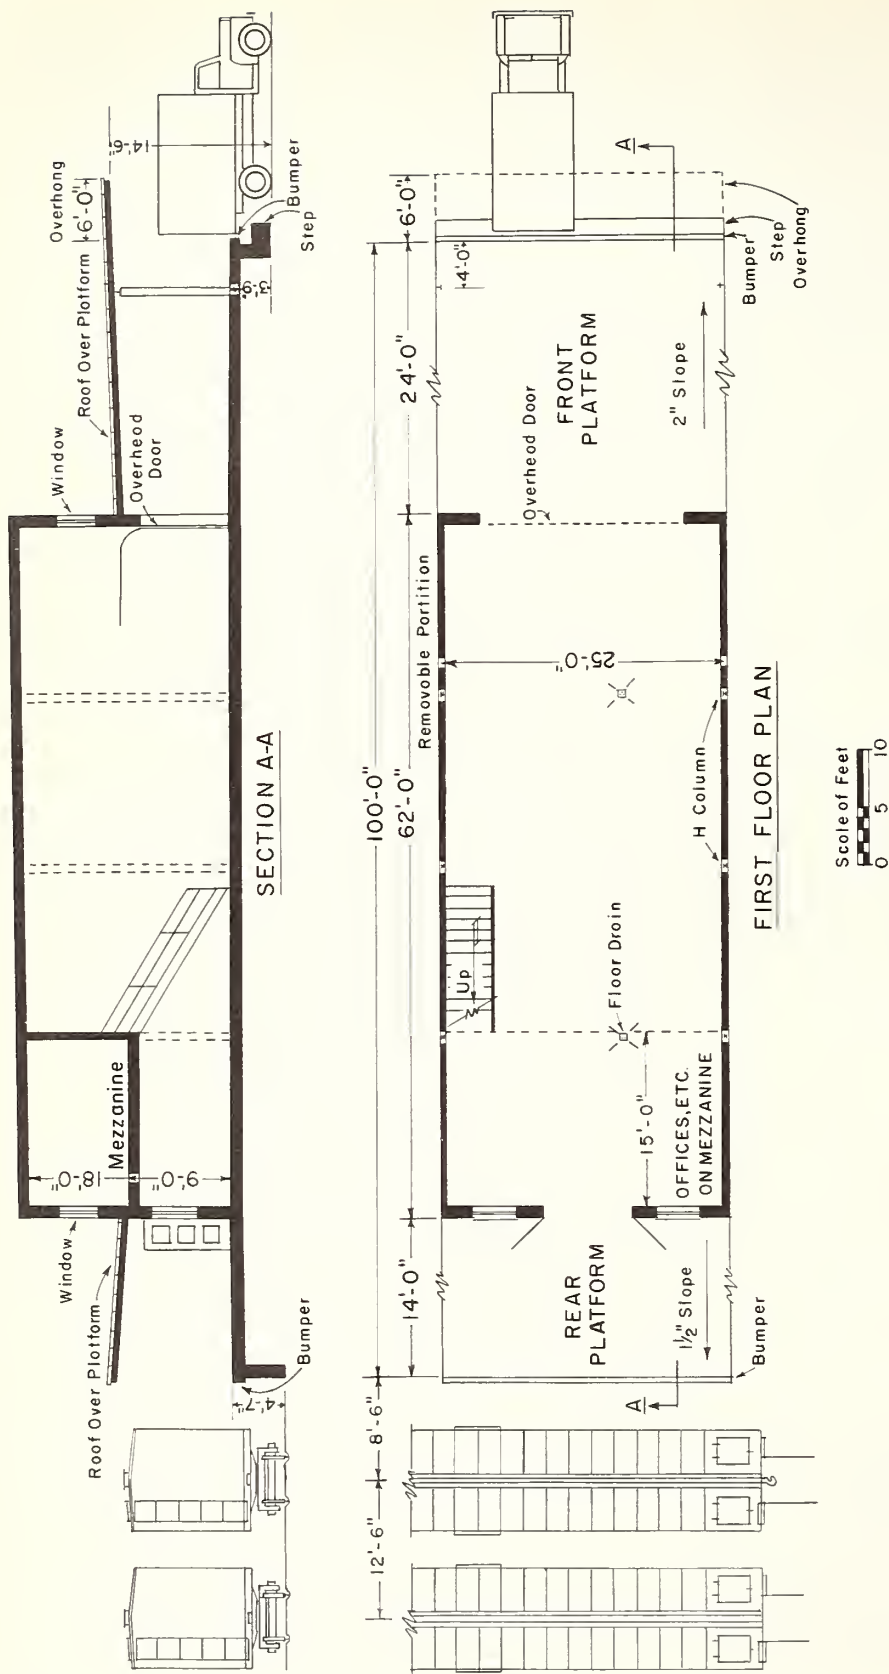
Plan for proposed wholesale fruit and vegetable store.
